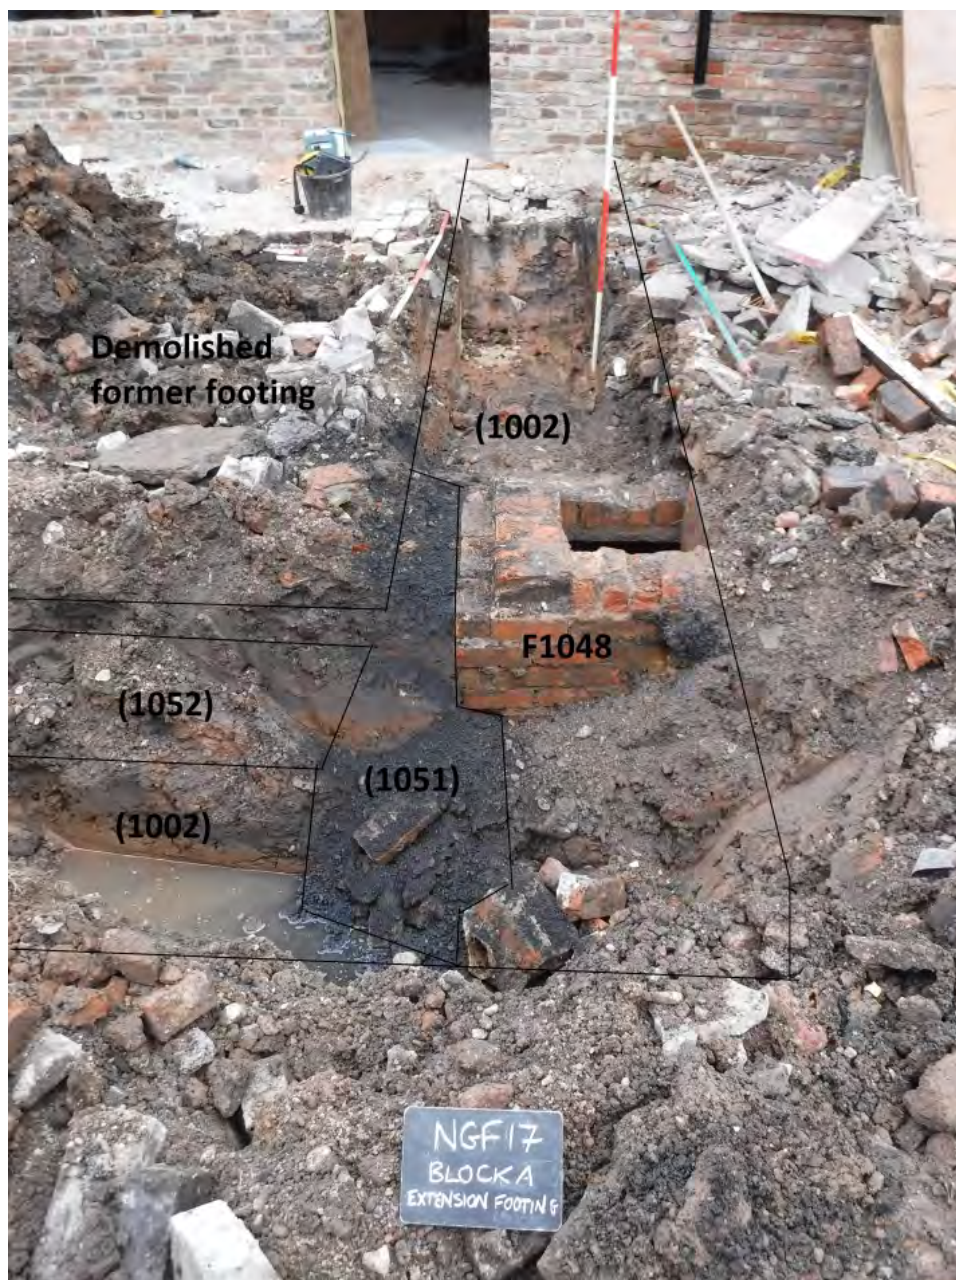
Manhole (F1048) within footing trench for new Block A extension. Note the bitumen deposit (1051) adjacent to manhole and below demolished former footing. Section also shows disturbed subsoil (1052) overlying natural clay (1002). Scale: 0.5m graduations.
